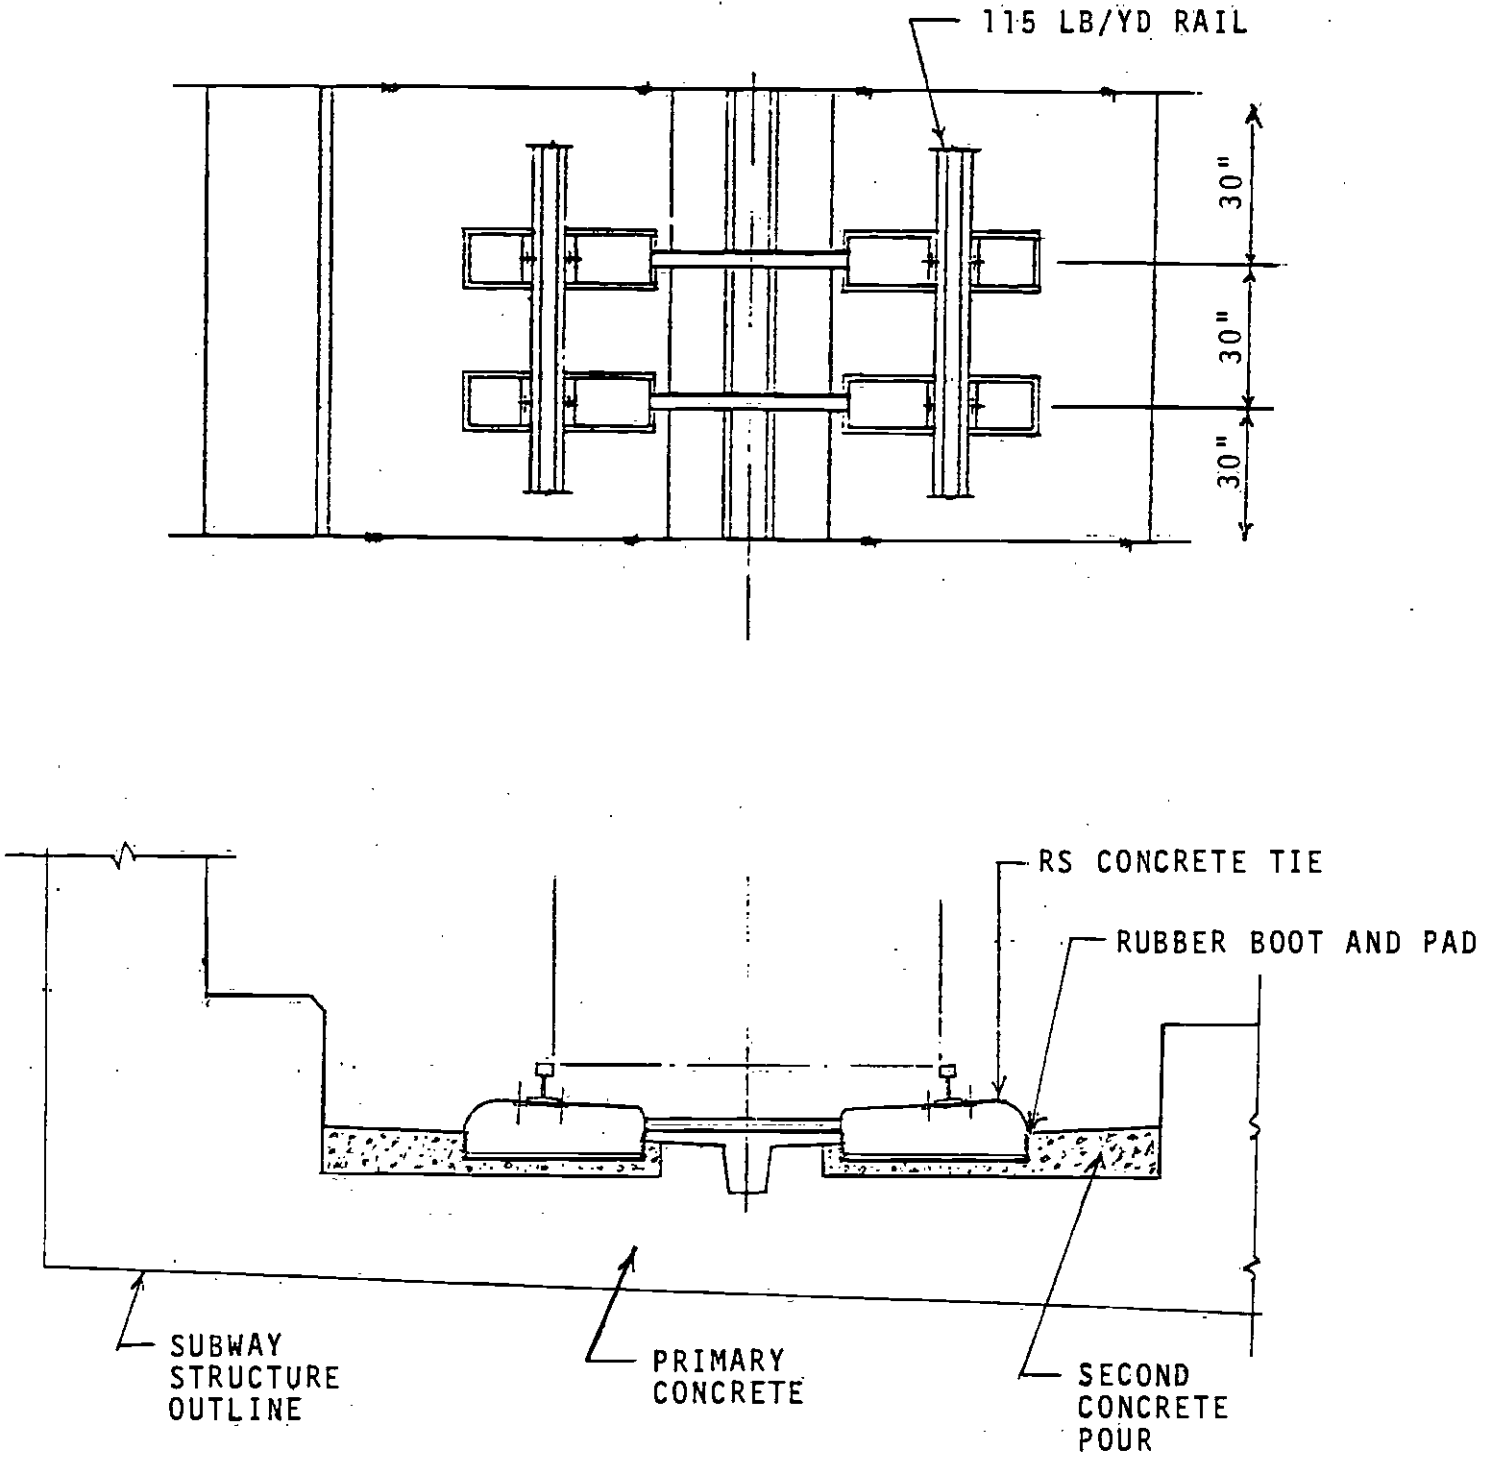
PLAN AND SECTION VIEW OF THE RS-STEDEF RESILIENTLY SUPPORTED TIE IN A BOX SECTION SUBWAY
